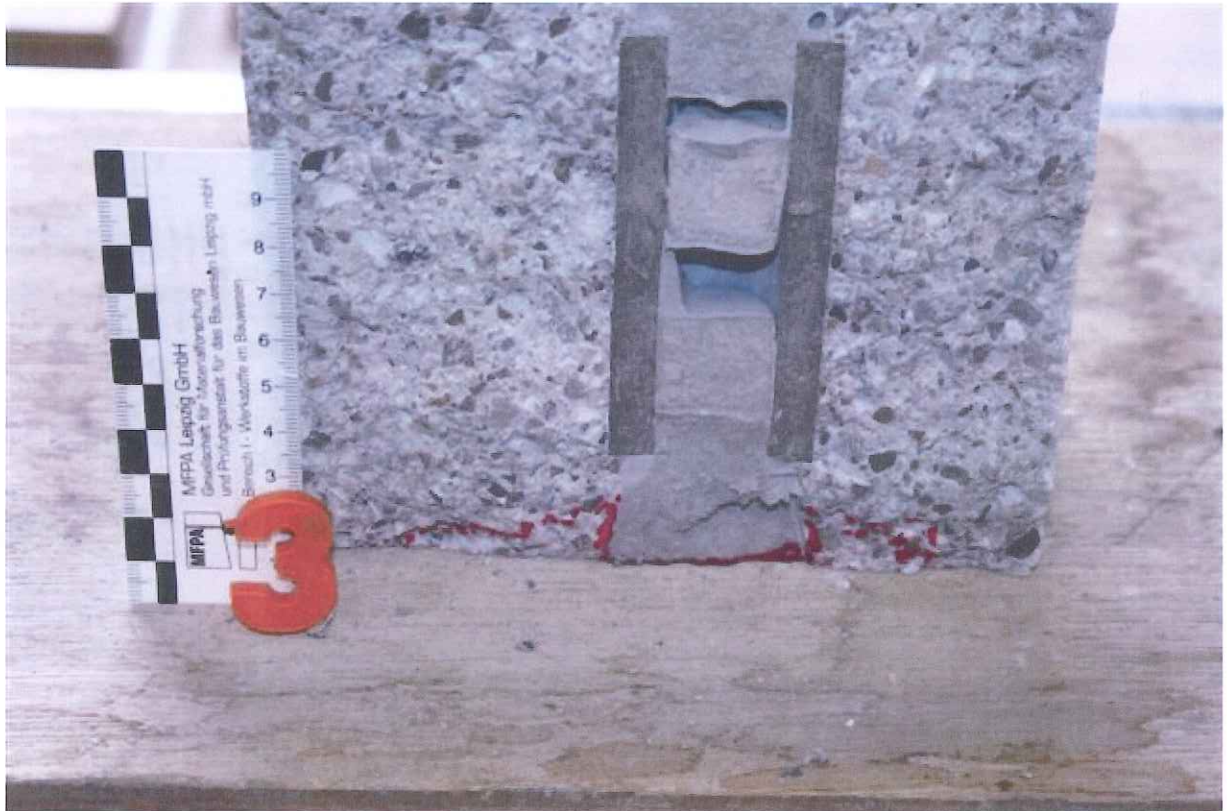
Series C 'FRANK fibre-reinforced concrete distance tubes – MR 22 sealed with one fibre-reinforced concrete plug St220020 and one 3 cm fibre-reinforced concrete sealing cone FBVKZ22T, sample 3
